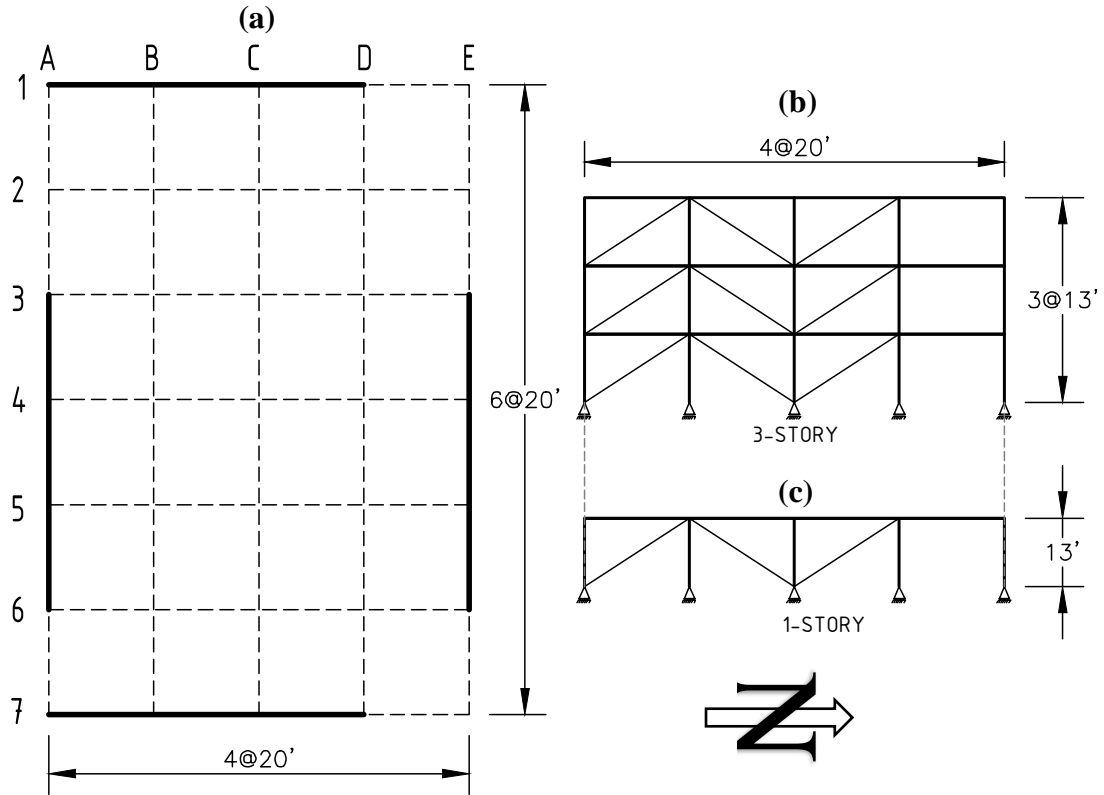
Prototype Buildings. (a) Plan view; (b) 3-Story Elevation view; (c) 1-Story Elevation view
